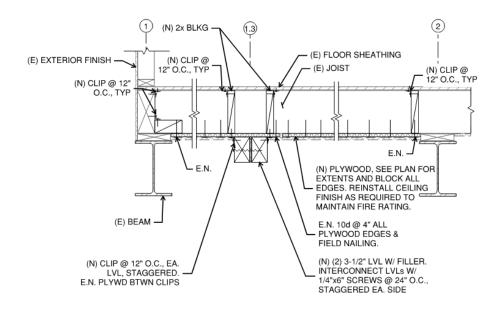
Wood-structural-panel soffit on underside of second-floor framing and load path connections from collector to diaphragm.
